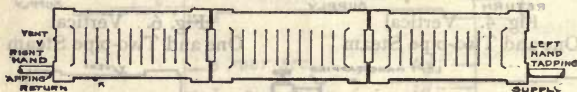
Assembled Three Horizontal Sections in Single Tier One and Two-pipe Steam.
